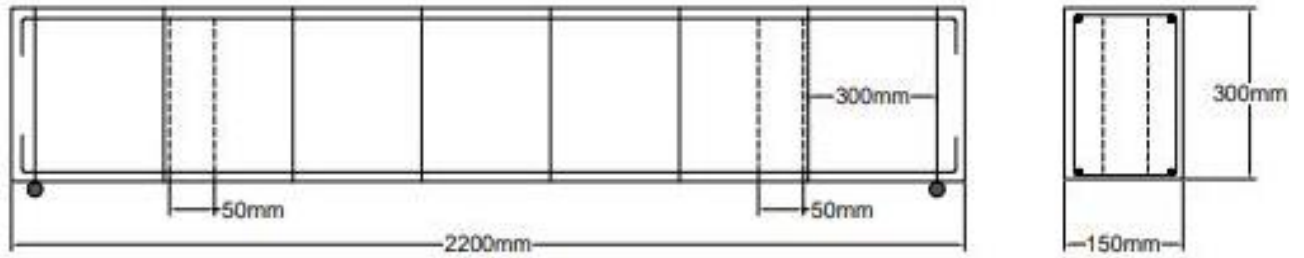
(e). Illustration of test beams (B4 and B9) with two openings and 50mm diameter PVC pipes placed vertically at both shear zones.
